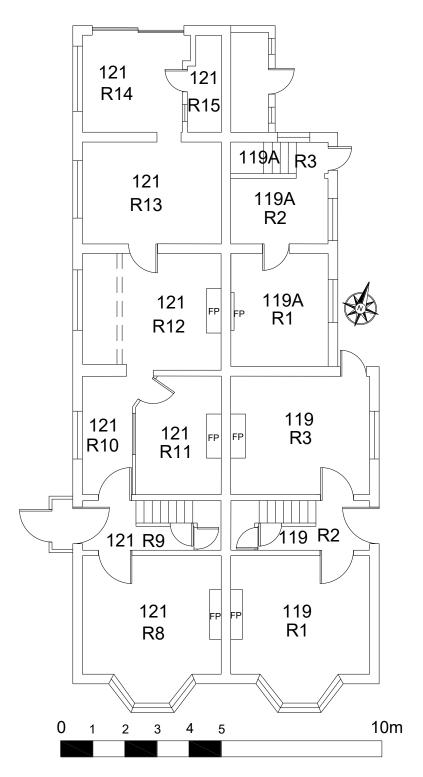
Ground floor plan of 119, 119A and 121 Paynes Road
